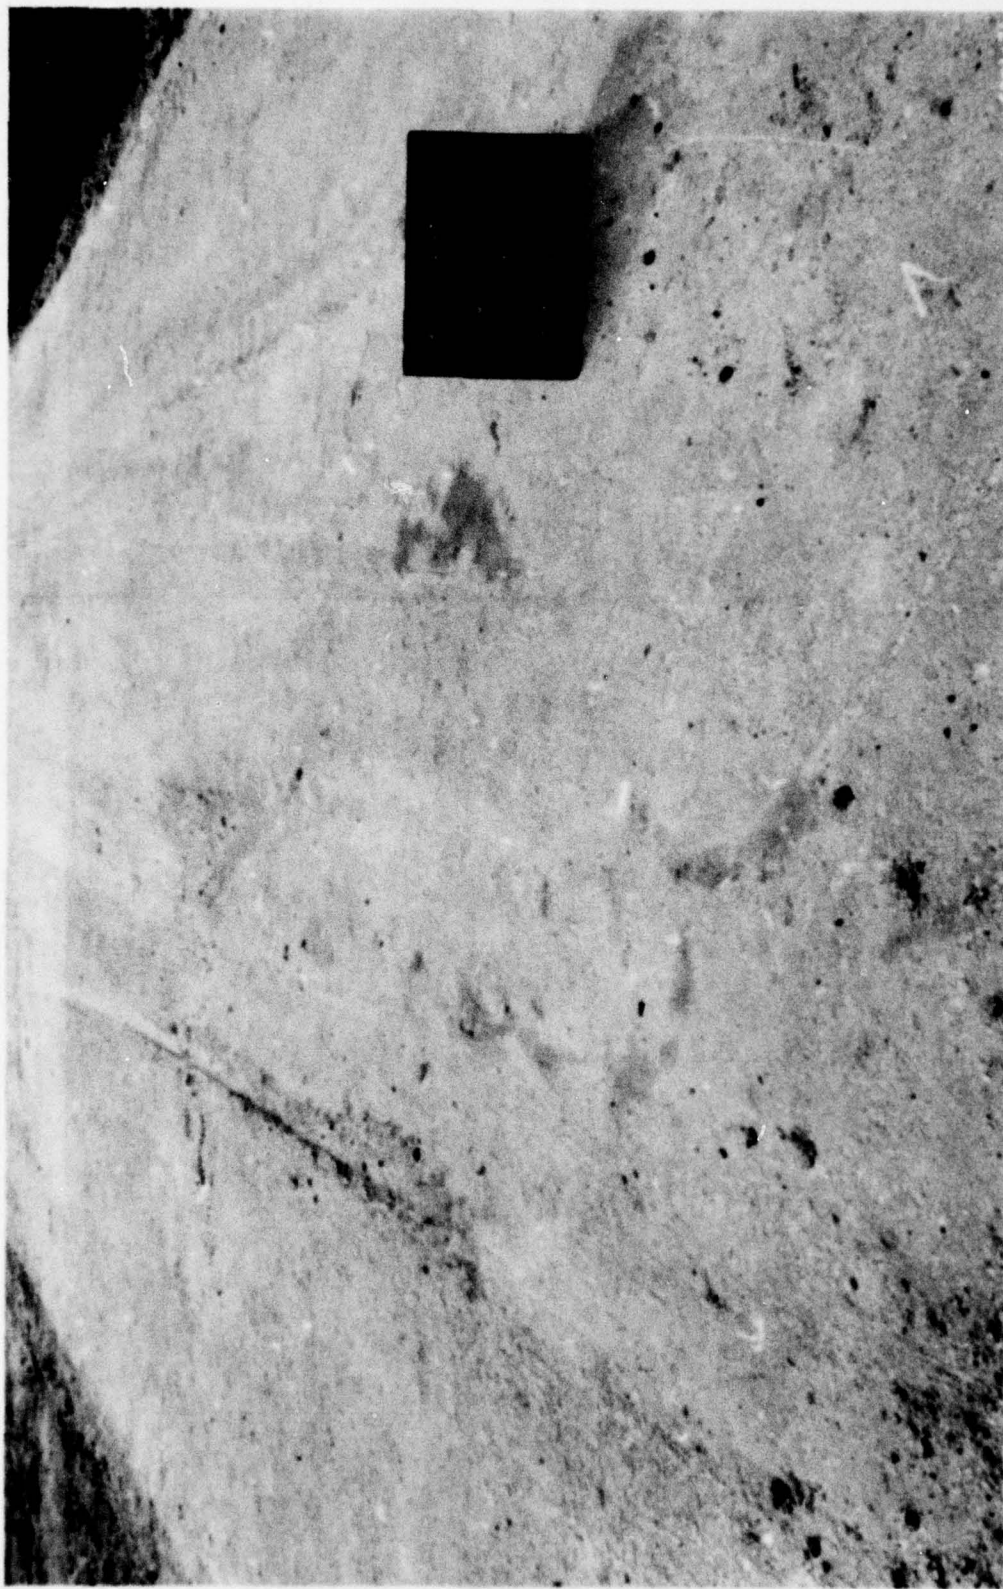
General view of item 1 (rigid pavement) prior to traffic
